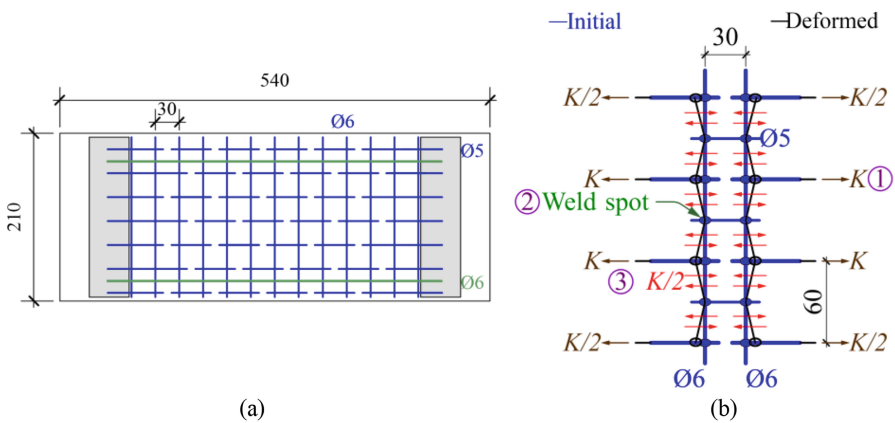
(a) Tailor-made reinforcement mesh with additional strengthening and (b) Sketch of a section of the Mesh with the three possible failure modes and the shear deformation (all dimension in [mm])
